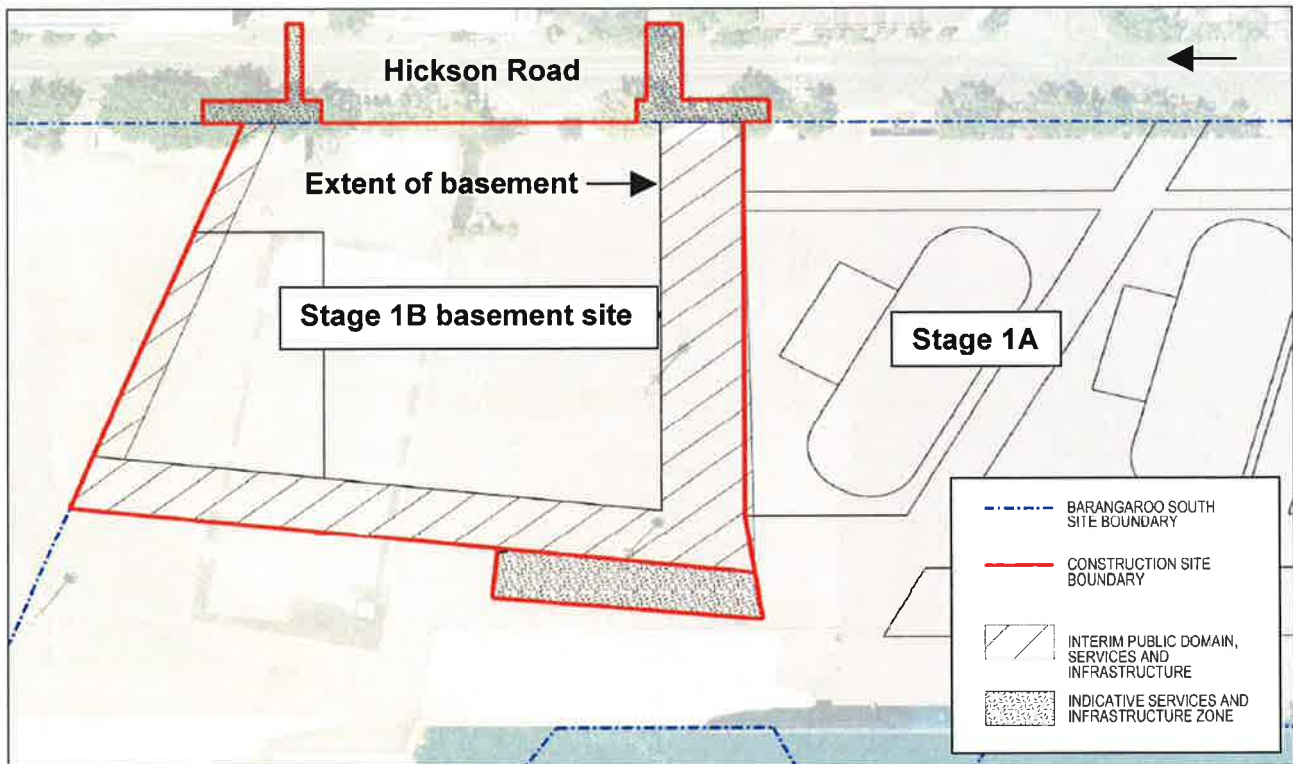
Extent of proposed Stage 1B basement and associated works (Source: EIS)
